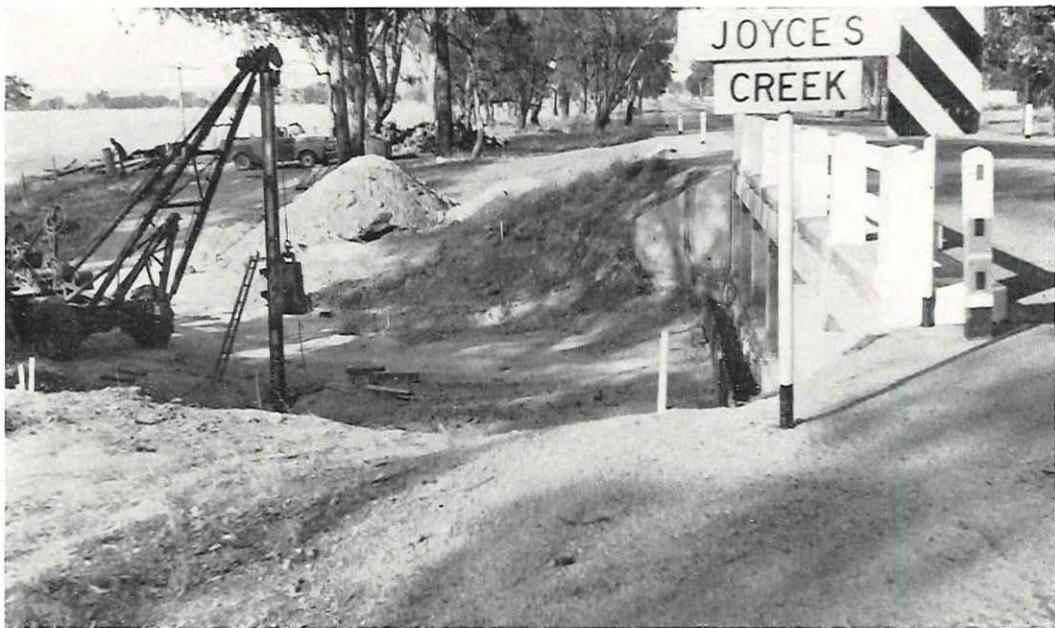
Hume Highway—Joyce's Creek. Driving steel sheet-piling for a cut-off wall.
